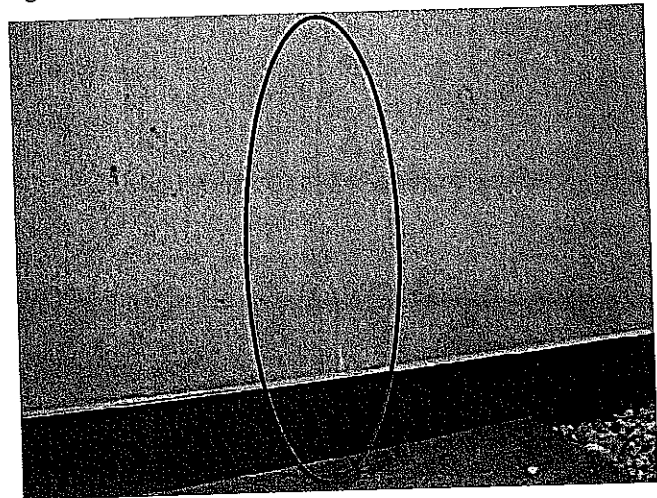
Typical crack at upper roof concrete wall.
